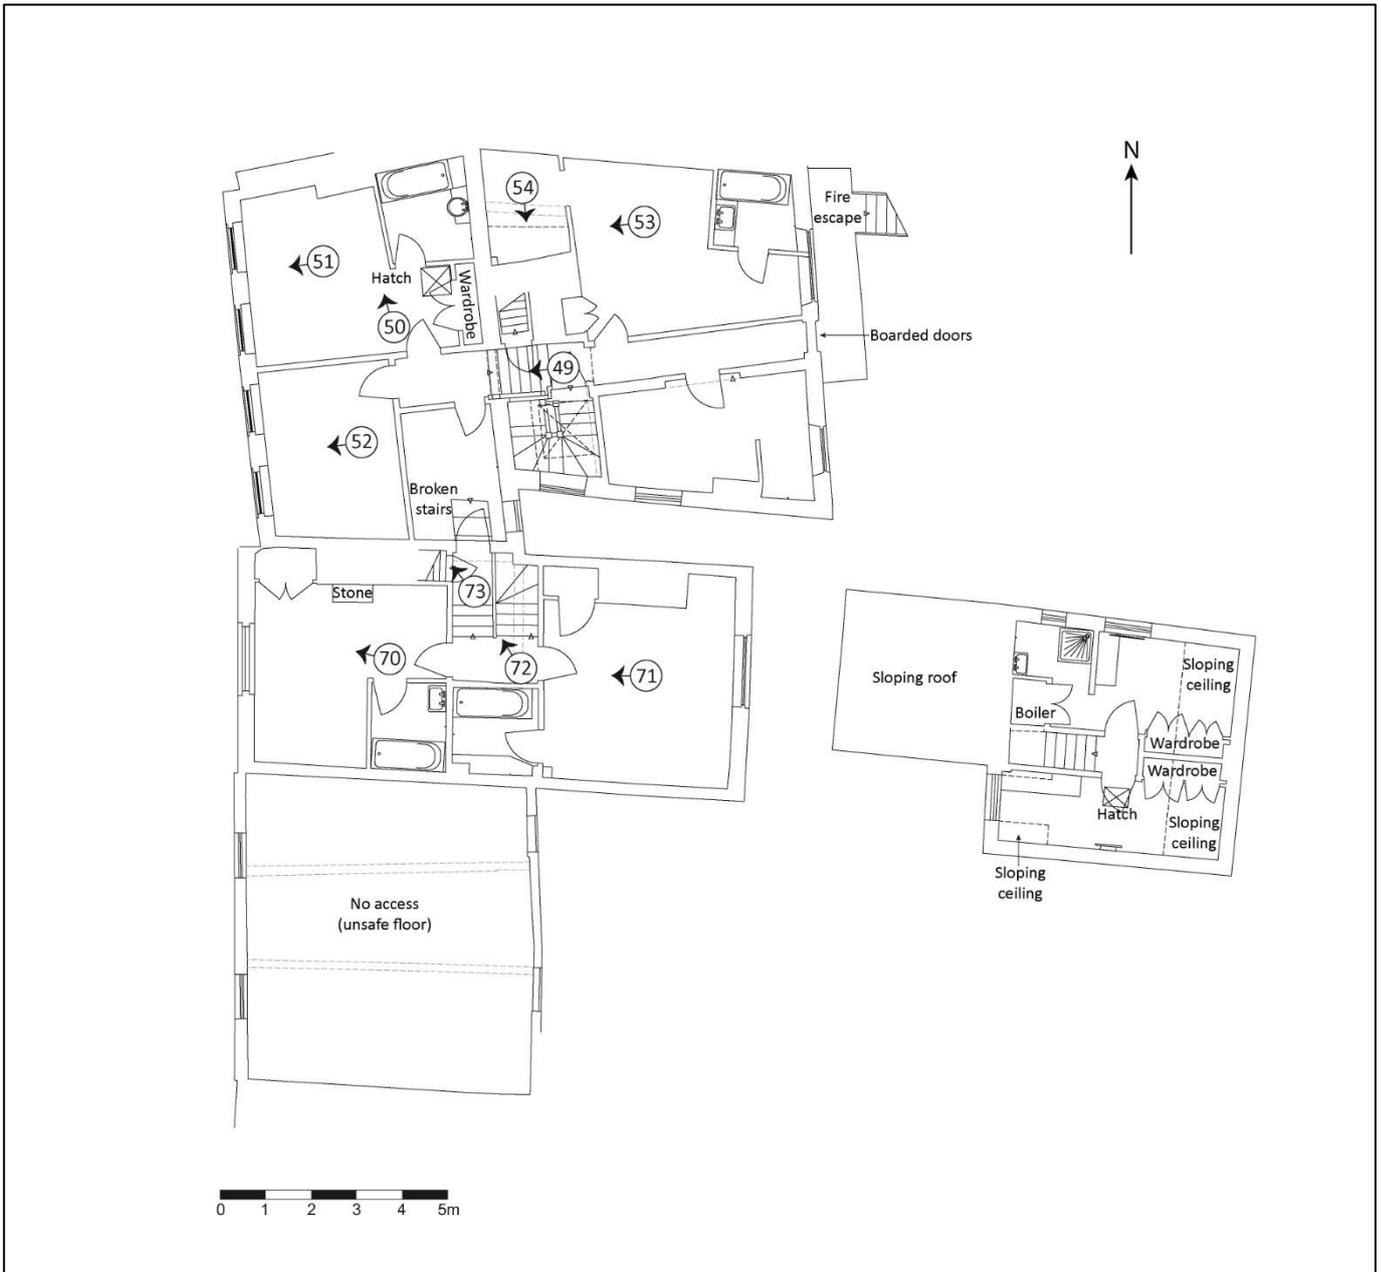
Annotated plan of second floor of Nos 17 & 17A High Street showing location of photos taken
